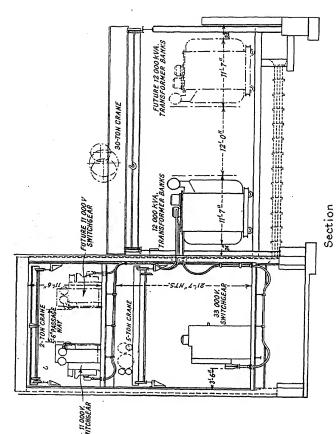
LAYOUT OF LARGE STATIC SUB-STATION
